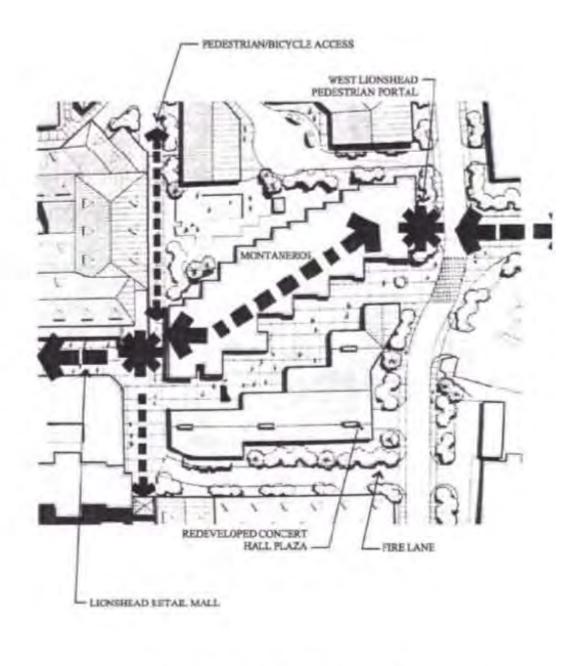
West Lionsheed Mall Pedestrian Connections
